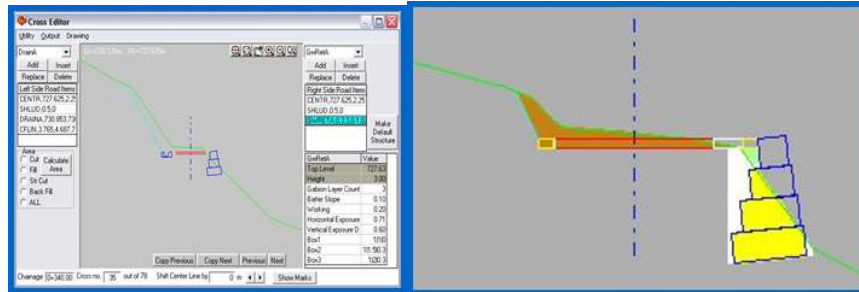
Example of Cross-Section Editing with Structures and Drains
